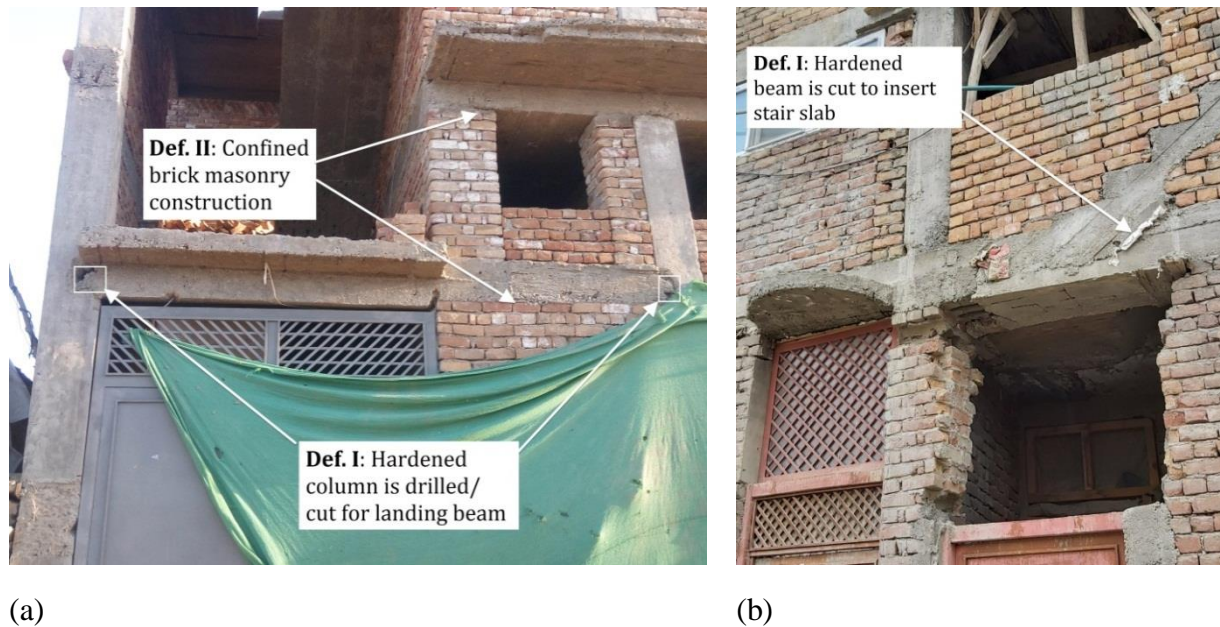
(a) Hardened column in a five story residential building is drilled/ cut and landing beam inserted (Photo from Mr. Naeem Sorosh, 2018). (b) Hardened beam is cut/ drilled at a four story residential building and stair slab is inserted (Photo by the author, 2020)
